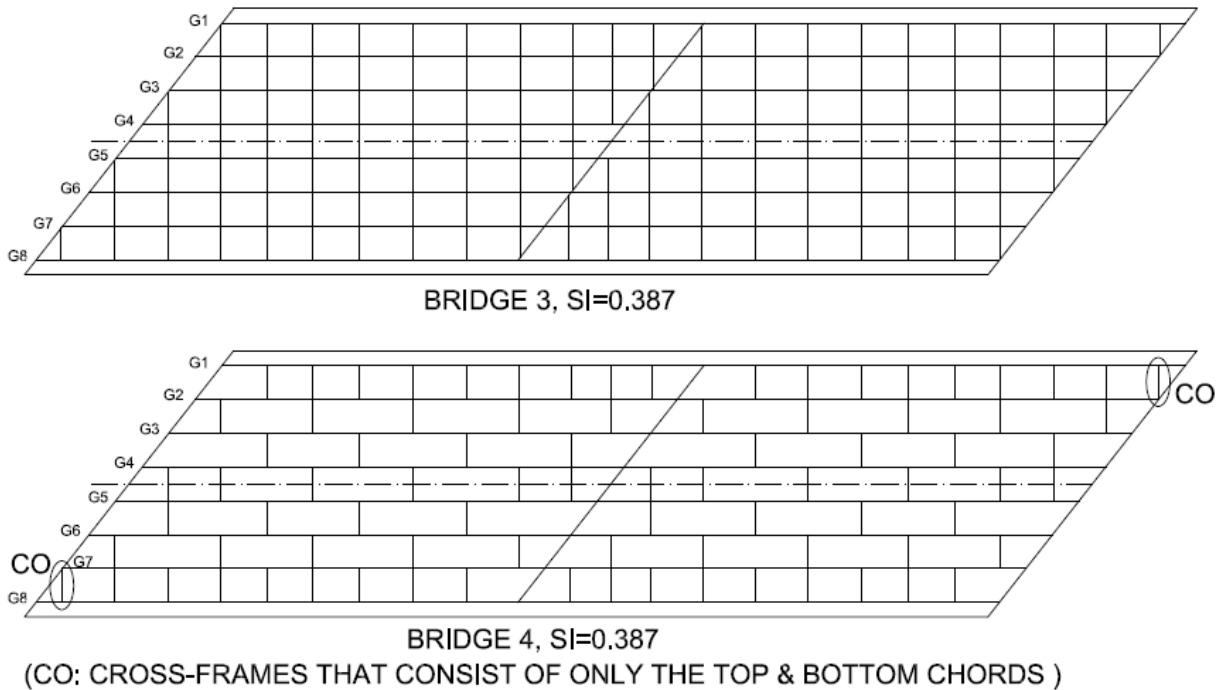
Illustration of development of alternative cross-frame framing arrangement, Bridge 3: original, Bridge 4: alternative.
